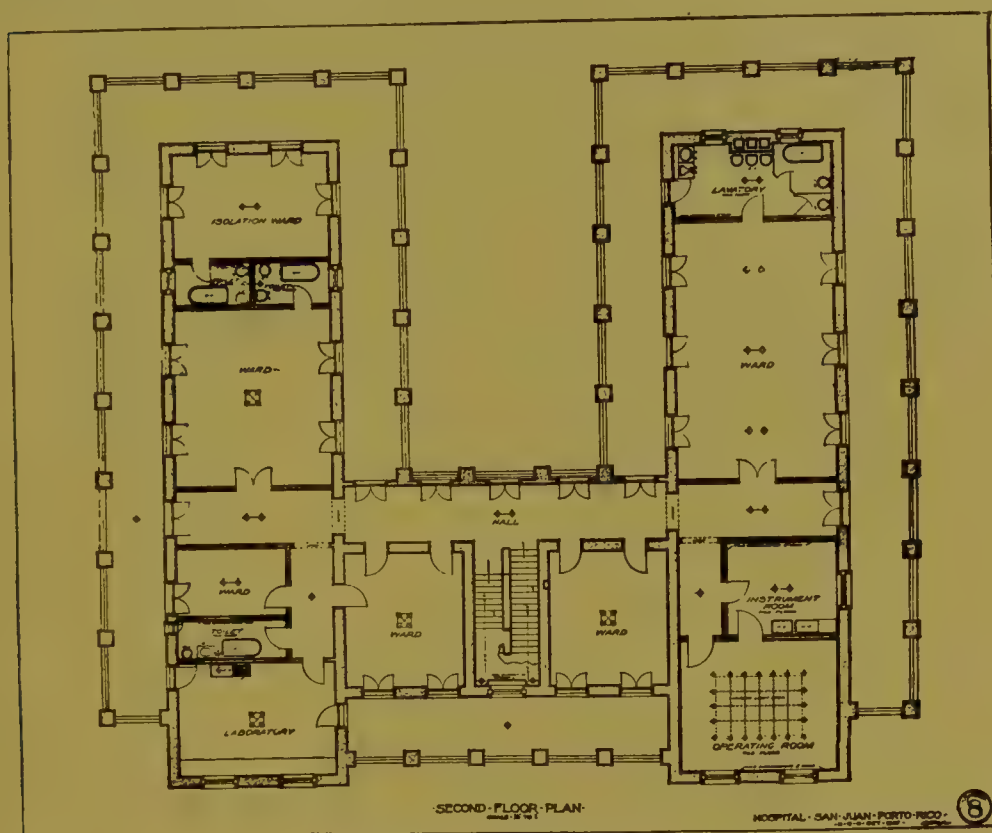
Post hospital in the Tropics. Second floor plan.
